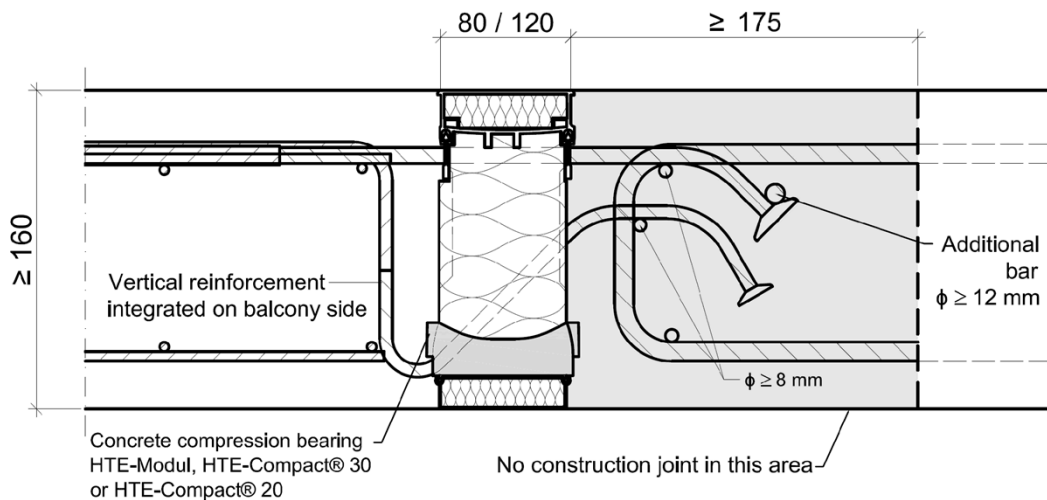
Example of Schöck Isokorb® Type K-O with CCE in ceiling connection without offset
